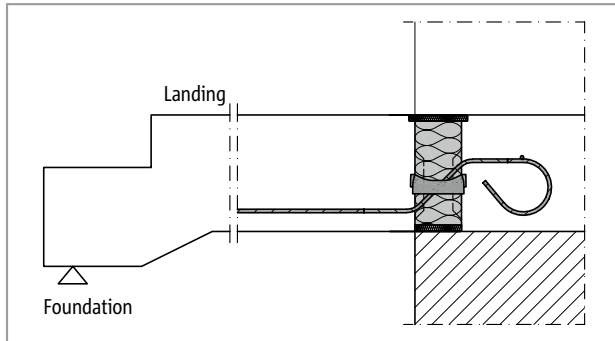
Schöck Isokorb® T Type CQ: Connection stair flight with thermal insulating cavity masonry (e.g. T Type CQ-V1 to T Type CQ-V5)
